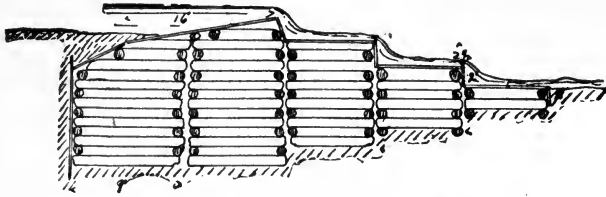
CROSS-SECTION OF ARIZONA WEIR.
